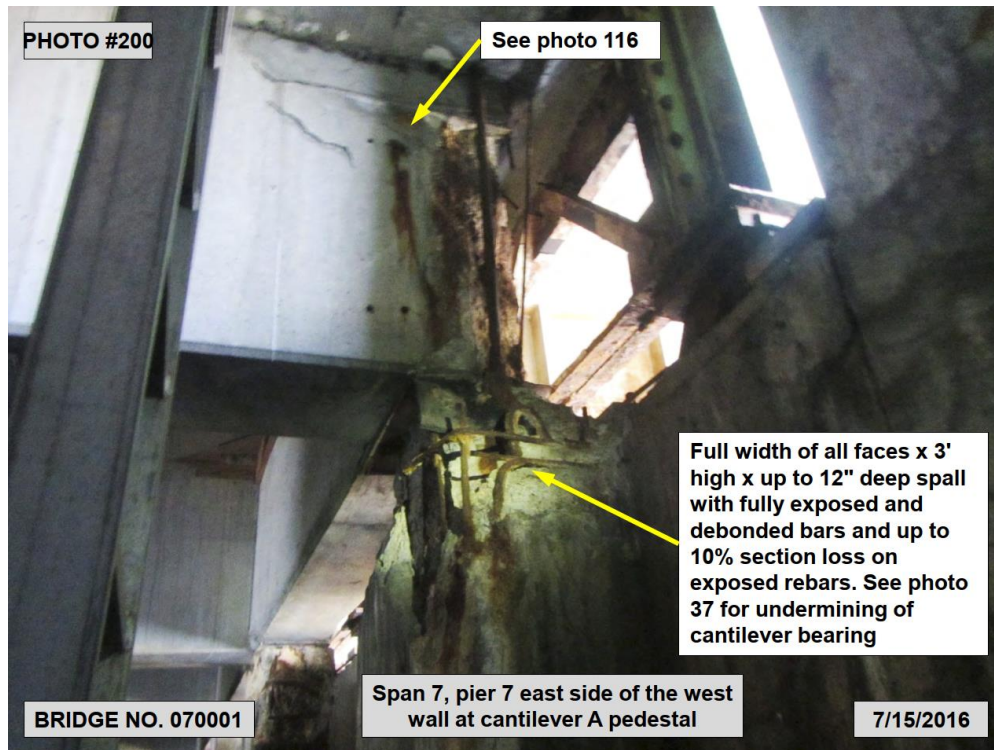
Inspection photo of exterior tie-down rod for cantilever beam A at Pier 7 taken July 2016 (TranSystems).
